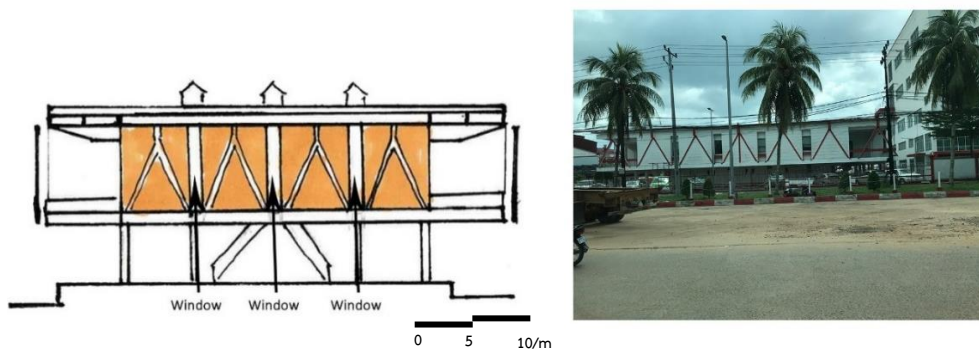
7 Diagram drawing and photo displaying the vertical windows of the west elevation
